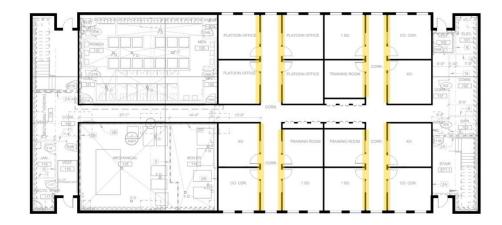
Suggested COF plan for effective daylighting design; note interior transom windows along halls shown in tan (similar design for both floors).
